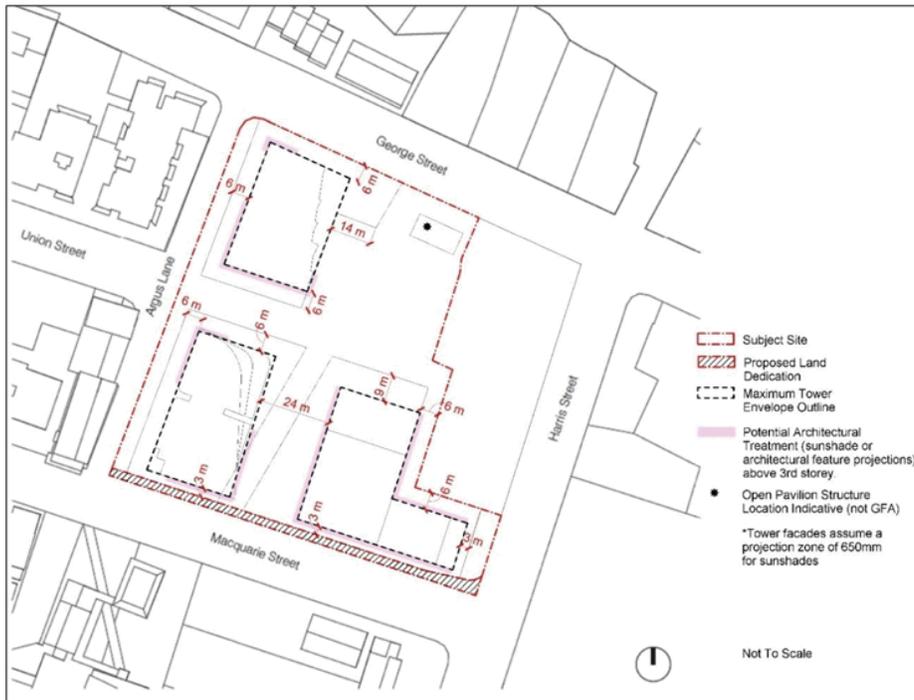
Control diagram: Setbacks to towers above podium
